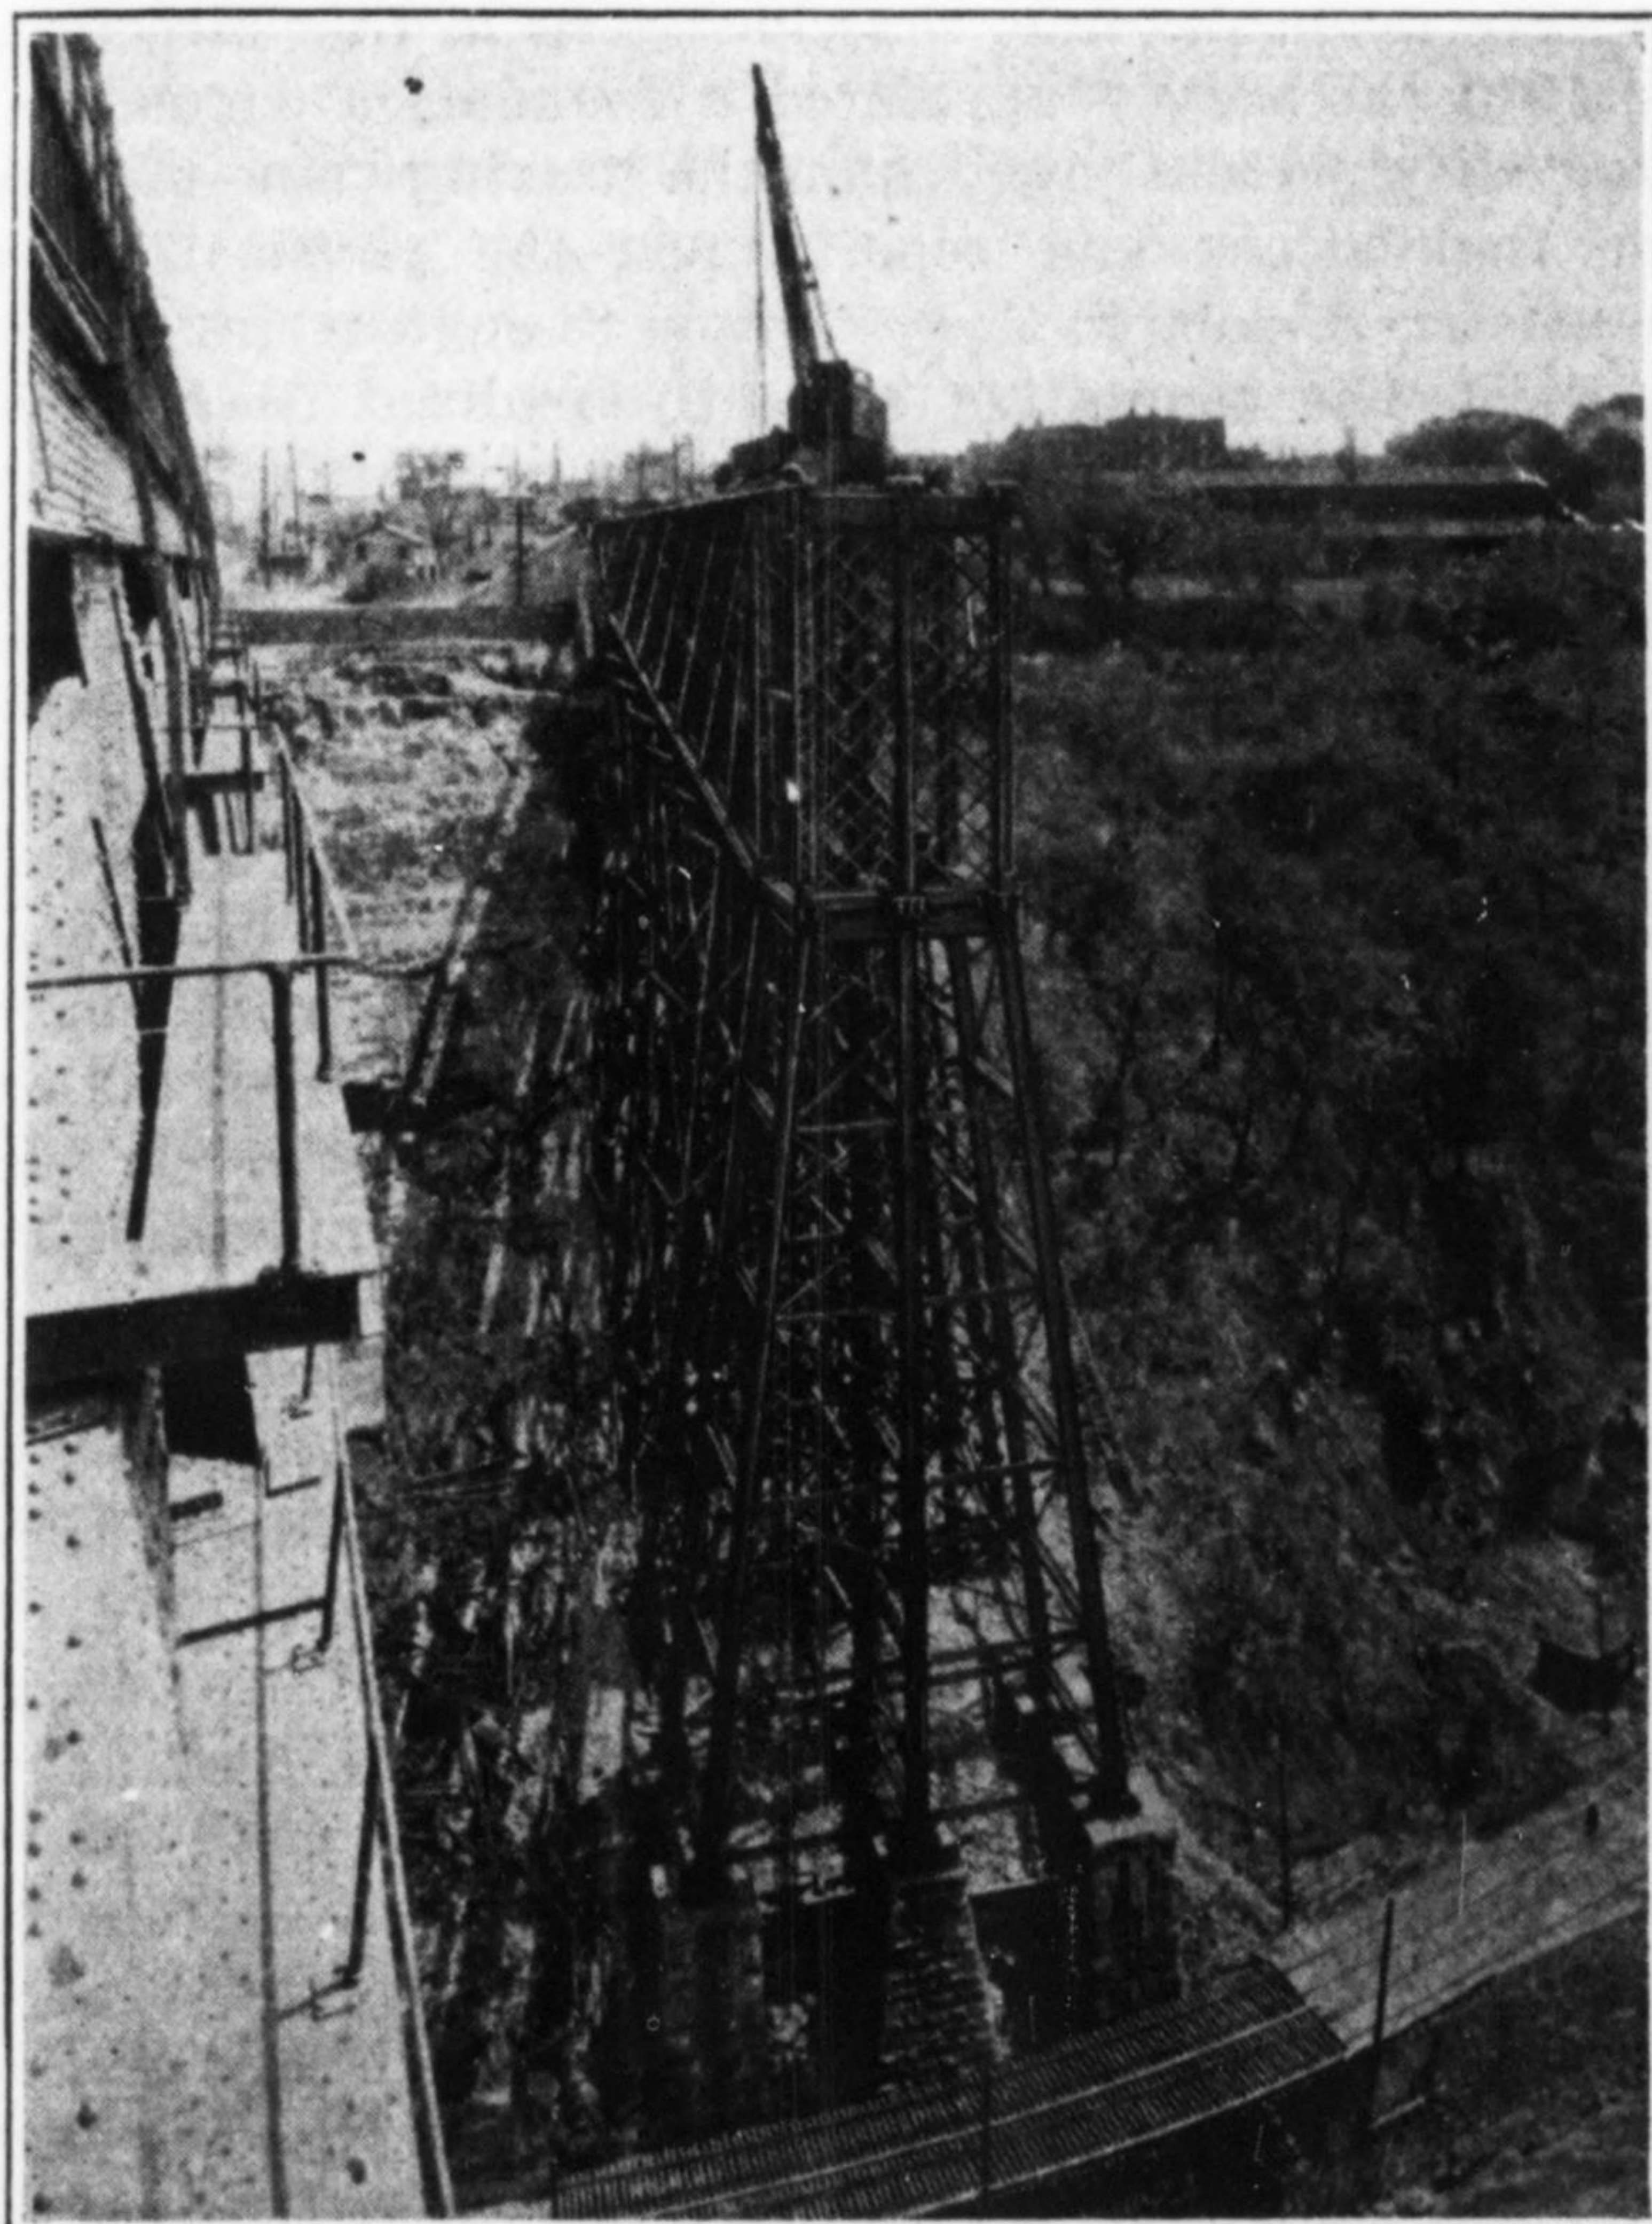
AMERICAN TOWER AND ANCHOR ARM; RIVER SPAN REMOVED (MAY 26, 1925)
